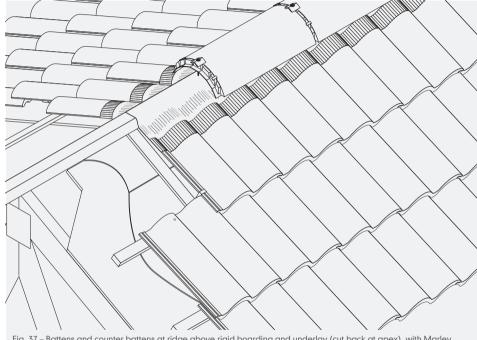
Battens and counter battens at ridge above rigid boarding and underlay (cut back at apex), with Marley ventilated dry ridge system
